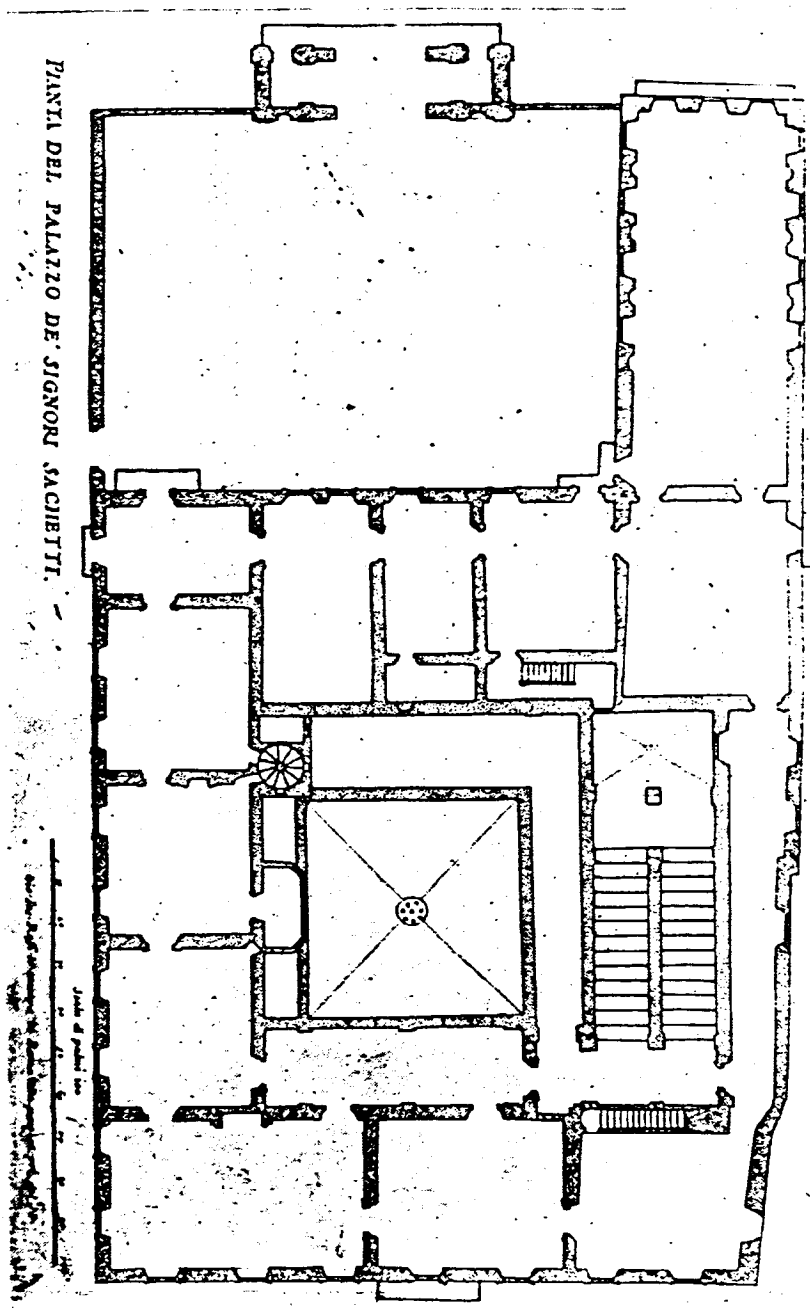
Palazzo Sacchetti: piano nobile plan (from Ferrerio & Falda)
